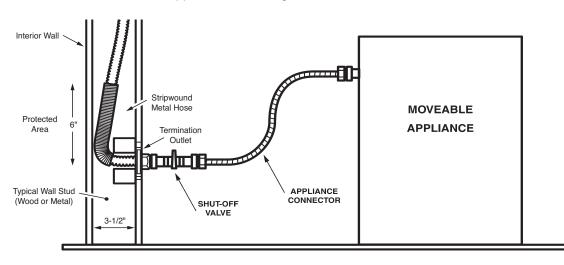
Stainless Steel Gas Connector Connection to a Movable Gas Appliance
